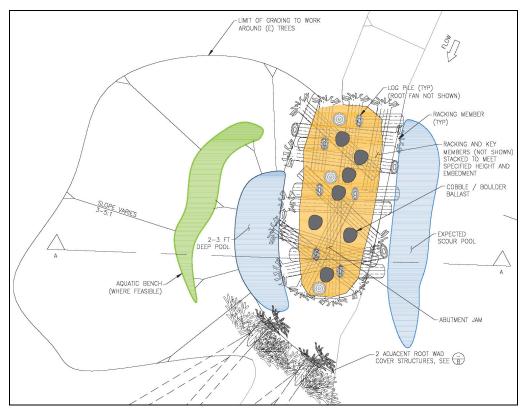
Design drawings for an Alcove with Abutment Jam in plan view.
